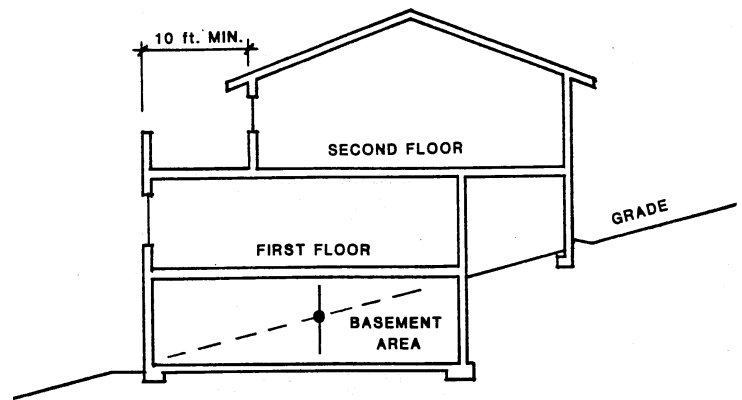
Basement Does Not Count 100% Towards Floor Area
